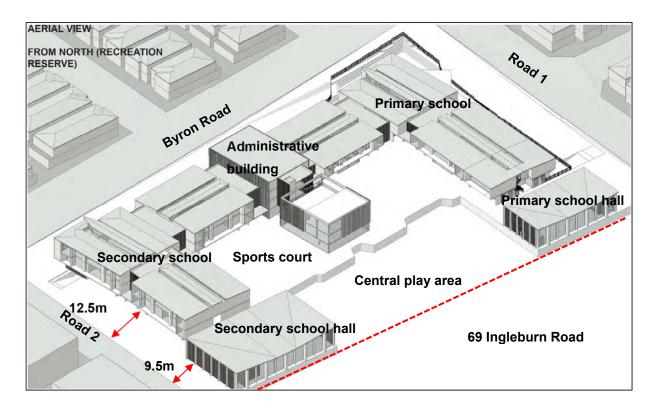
| Proposed built form (north-western corner) and setbacks (Source: Applicant's EIS 2019)
